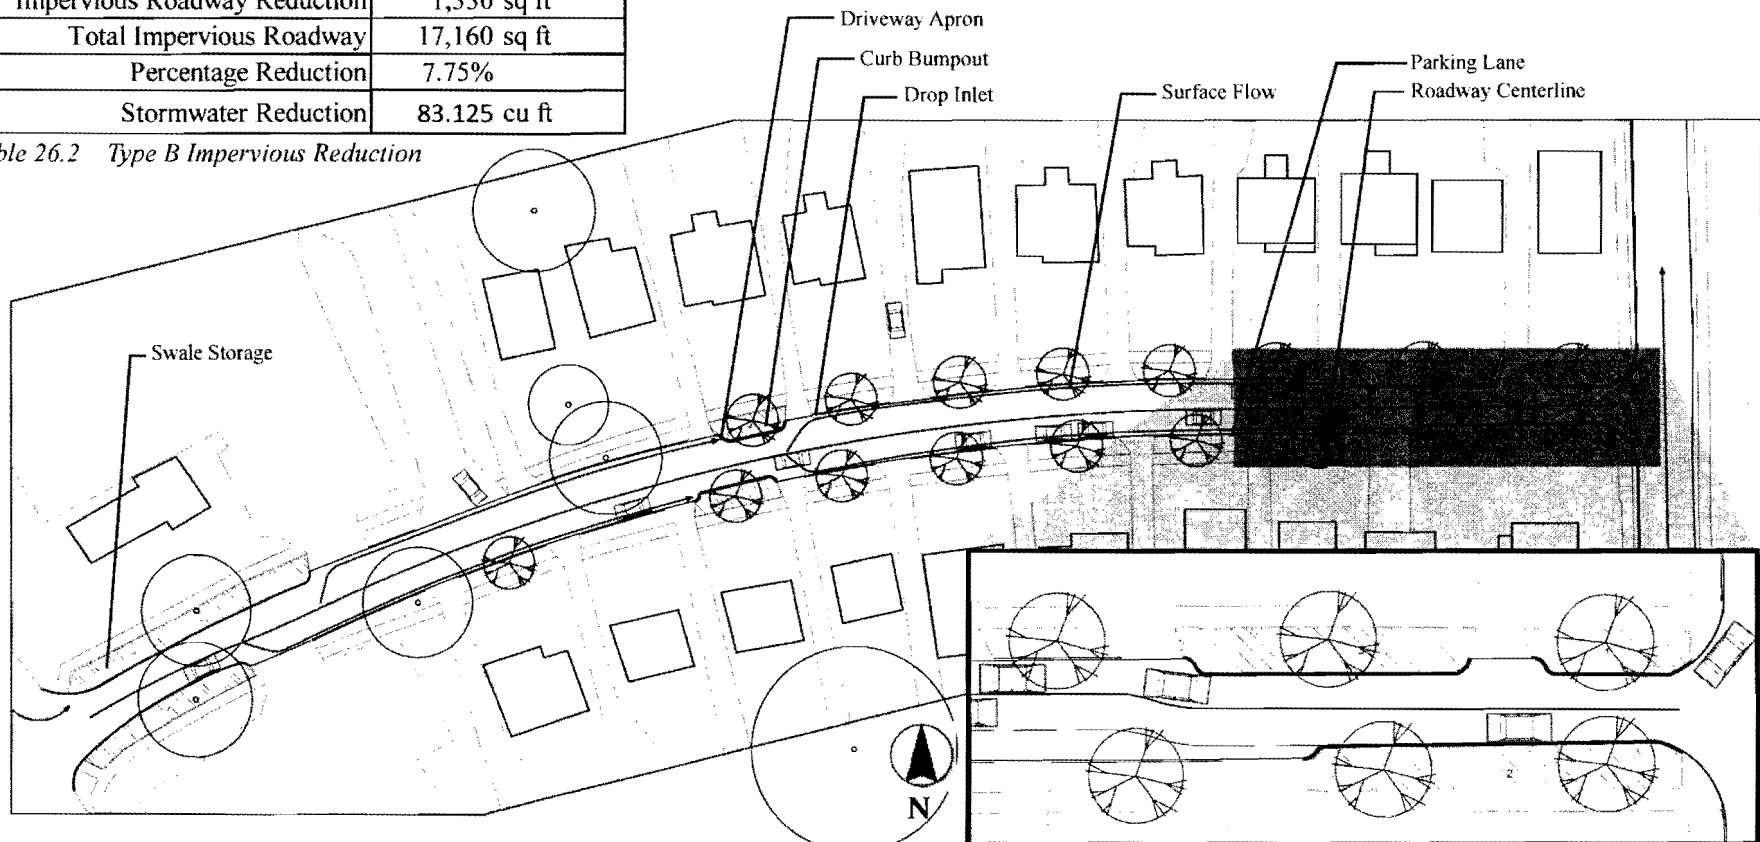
Thornton Avenue ROW Proposed Design between Turney & 112th Street
